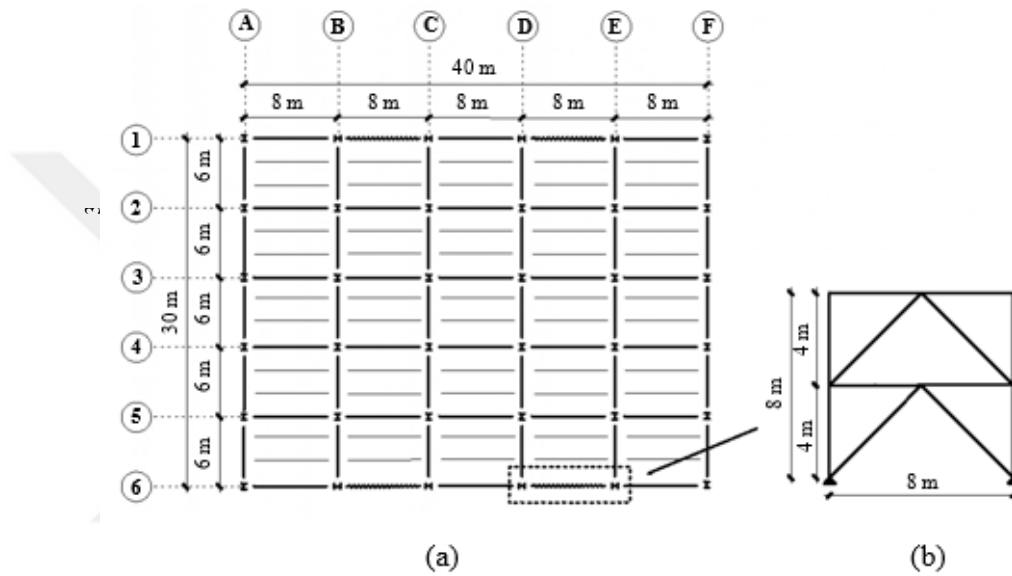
(a) Plan view of building and (b) elevation view of braced bay used in this study
